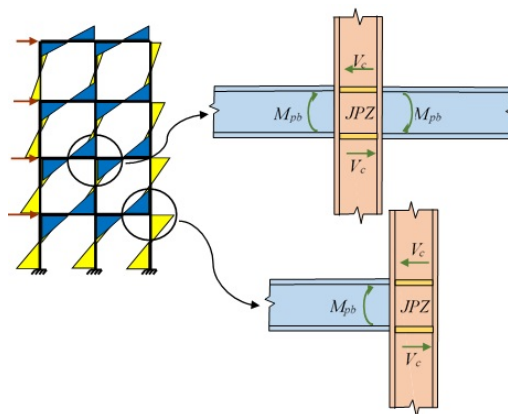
Interior and Exterior Beam Column Joints in a MRF with the forces under lateral load conditions
